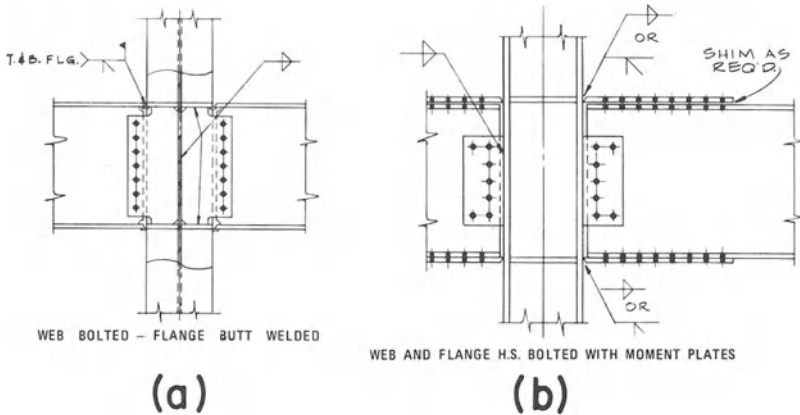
(a) Beam-to-column moment connection. Bolted web-flange butt welded. (b) Beam-to-column high-strength bolted connection (Courtesy: Steel Committee of California.)
